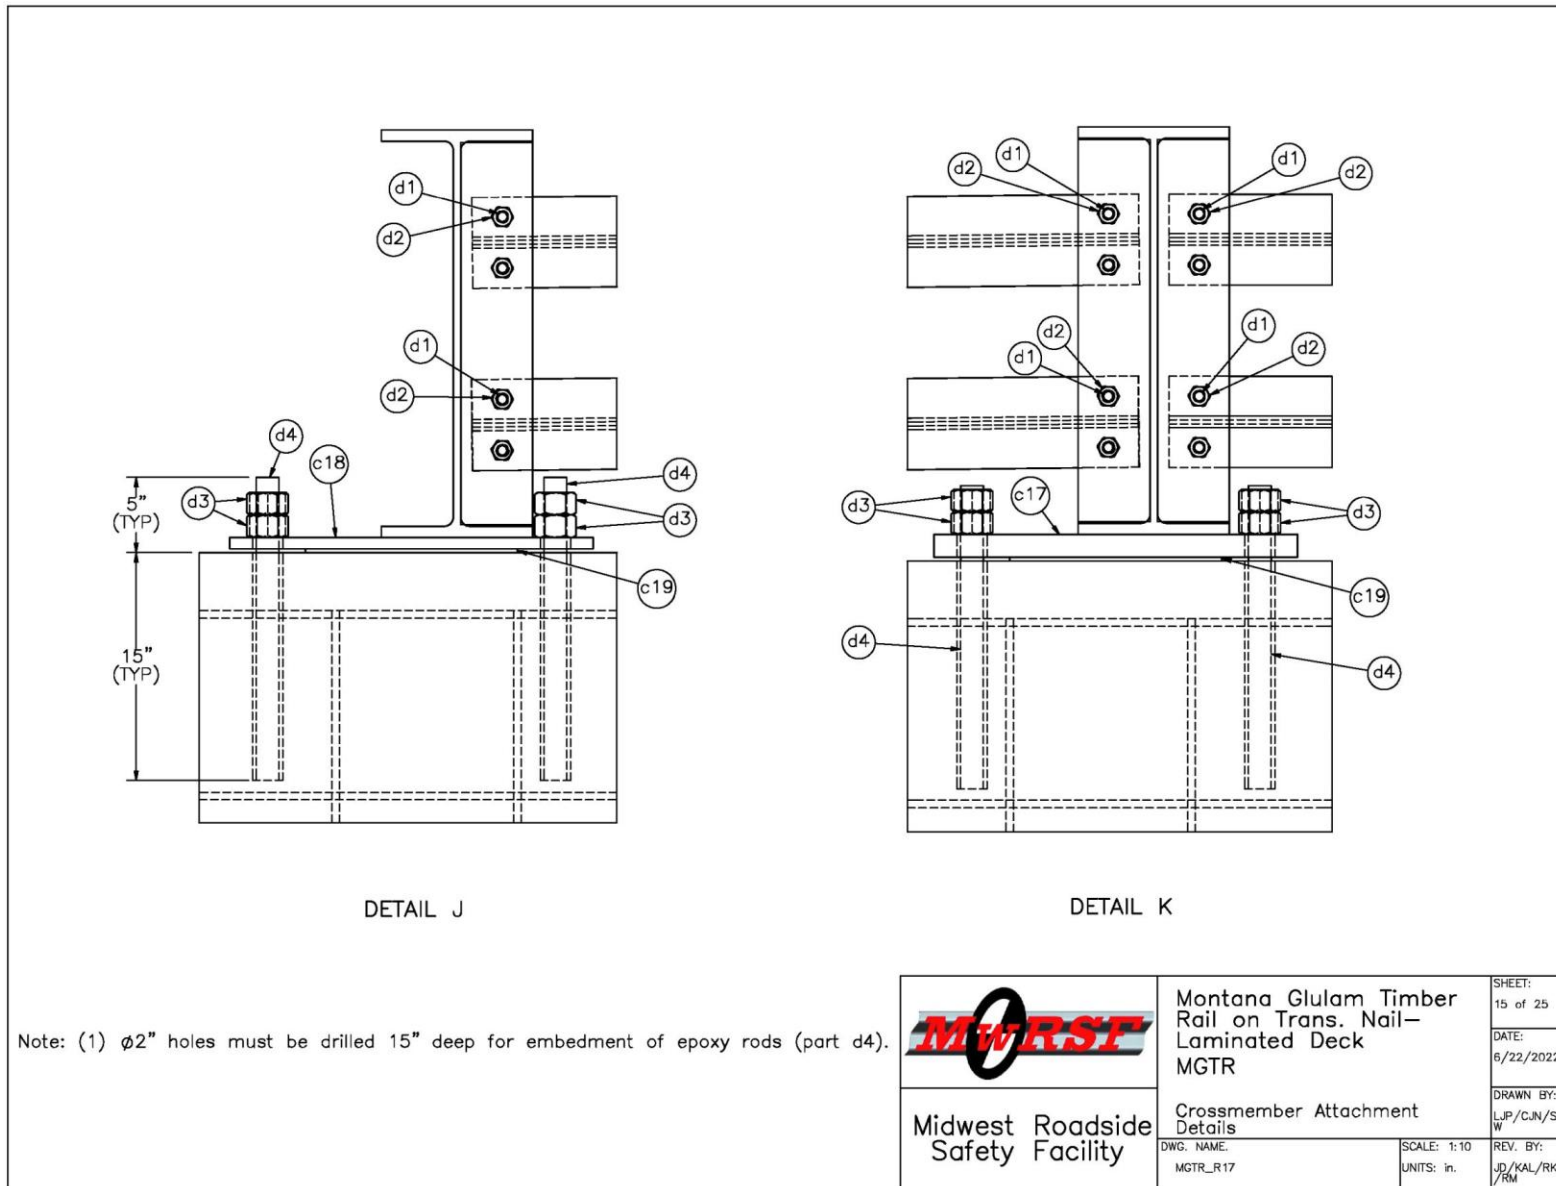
Crossmember Attachment Details, Test Nos. MGTR-1S and MGTR-1D
